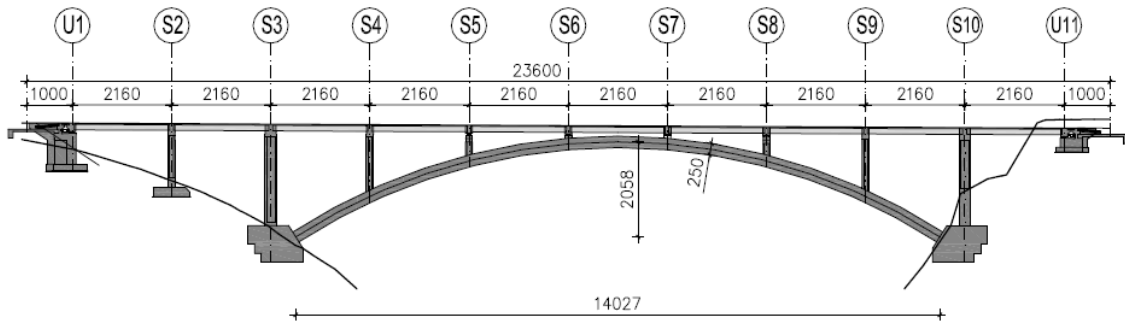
Longitudinal layout of Cetina River Bridge⁵.
